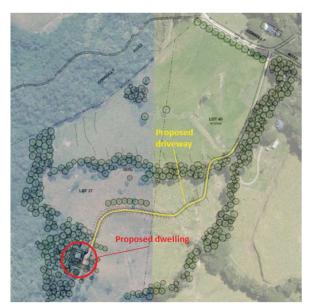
Proposed development at 105 Connolly Road, Mowbray
